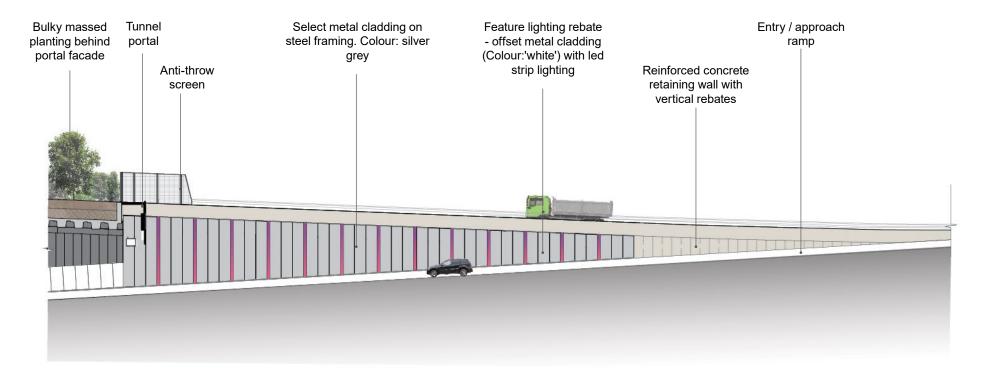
M4-Anzac Entry Portal - dive wall elevation - motorists side
